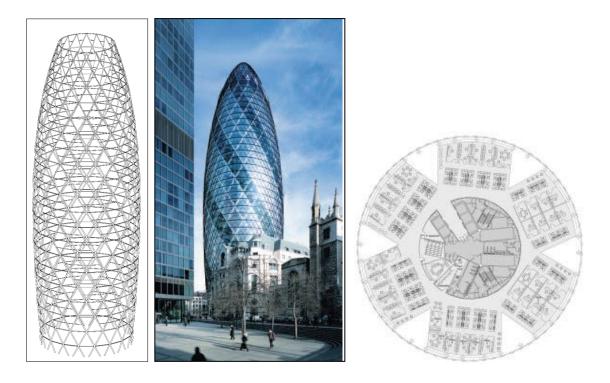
Swiss Re Building (Ma Mistructe, 2006.pp 38)
